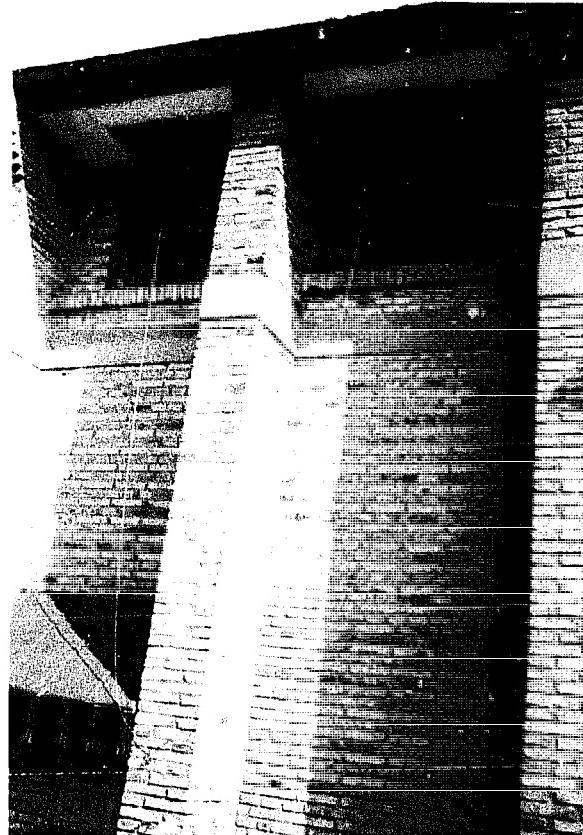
Type "51" bulk grain warehouse. Windows for ventilation adjustable from ground level with a rope. (First Depot, Wuxi)
